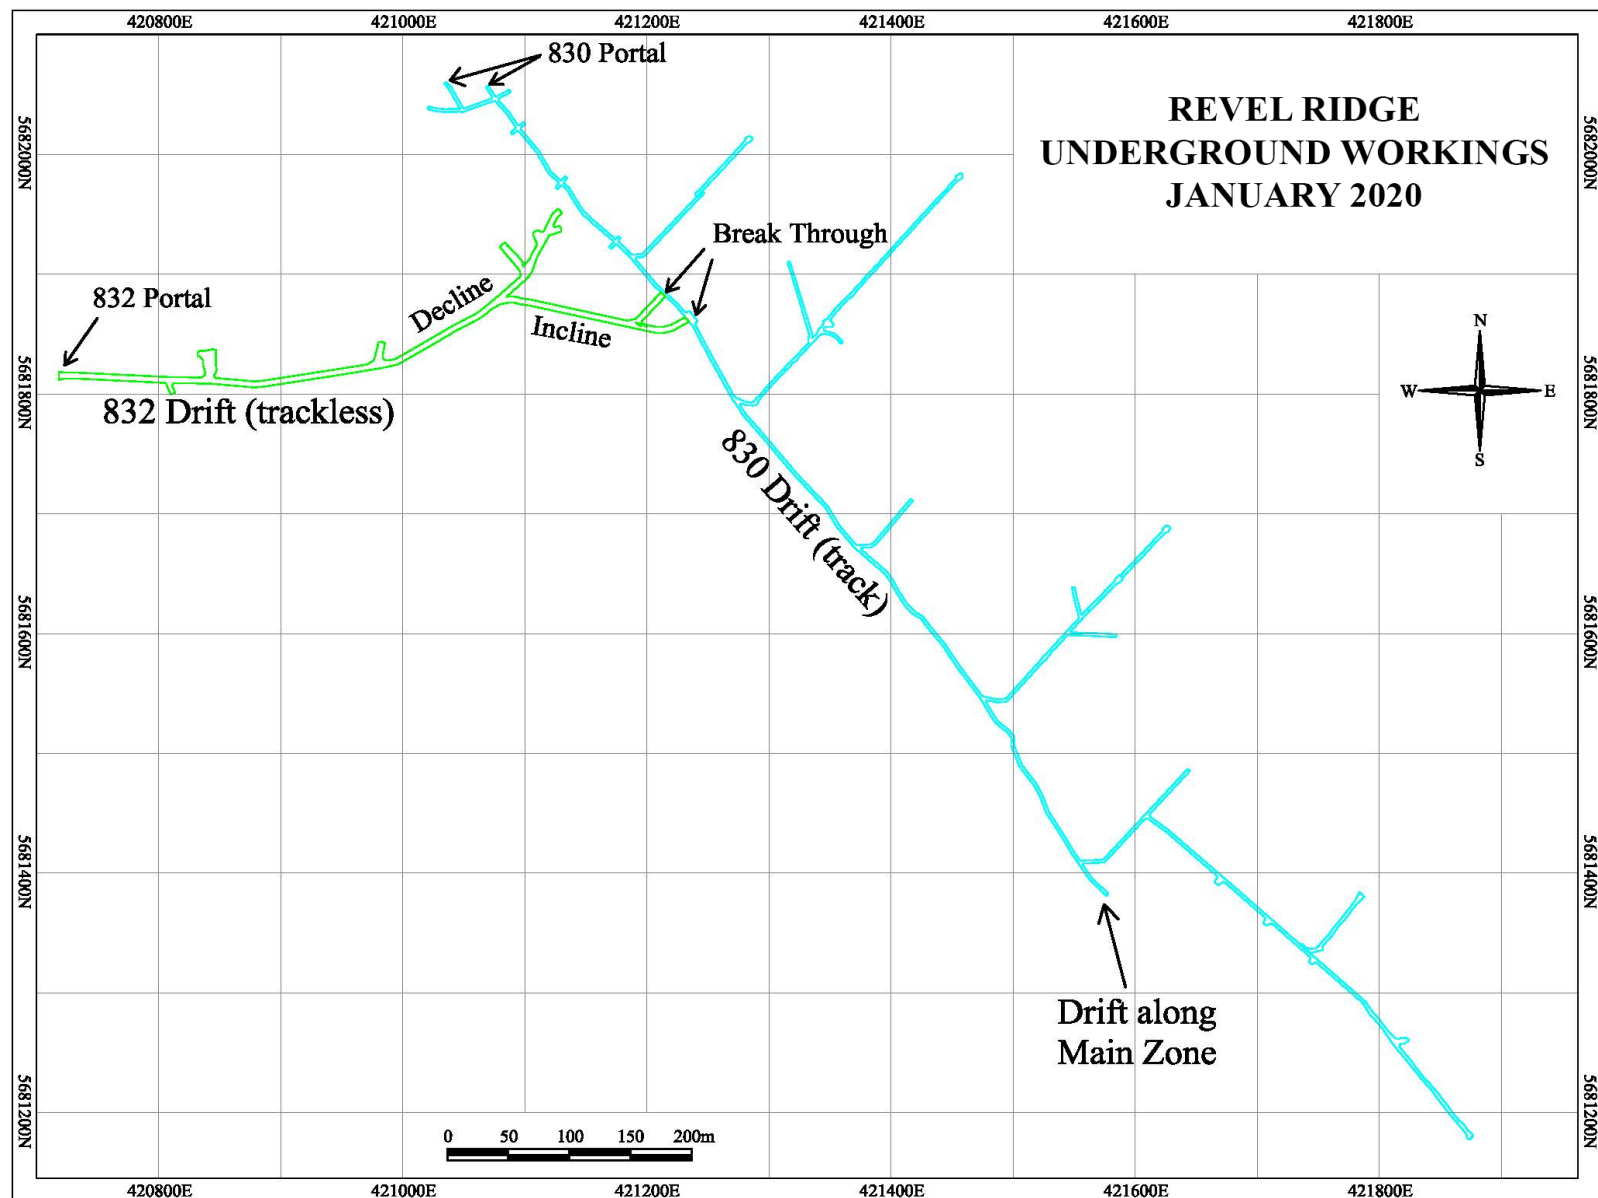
PLAN VIEW OF THE UNDERGROUND WORKINGS OF 832 M AND 830 M LEVEL DRIFTS
